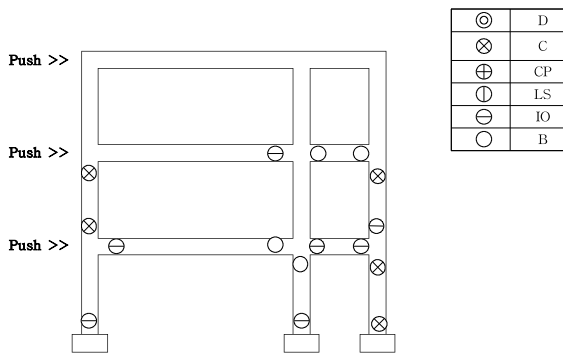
Hinge distribution at the performance point for the existing frame not considering masonry infill walls
